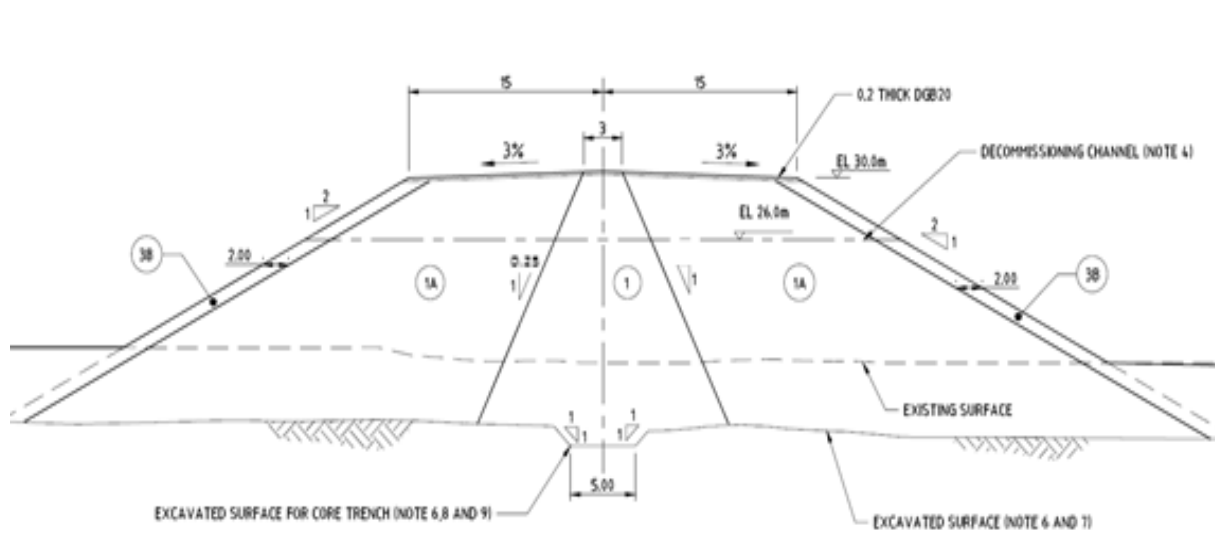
Typical cofferdam section (extract from Drg ST-3115)
